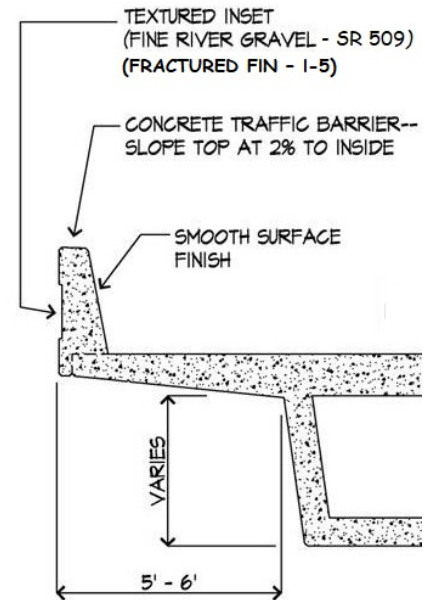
Textured Inset Location for Barriers on Bridges and Retaining Walls.
